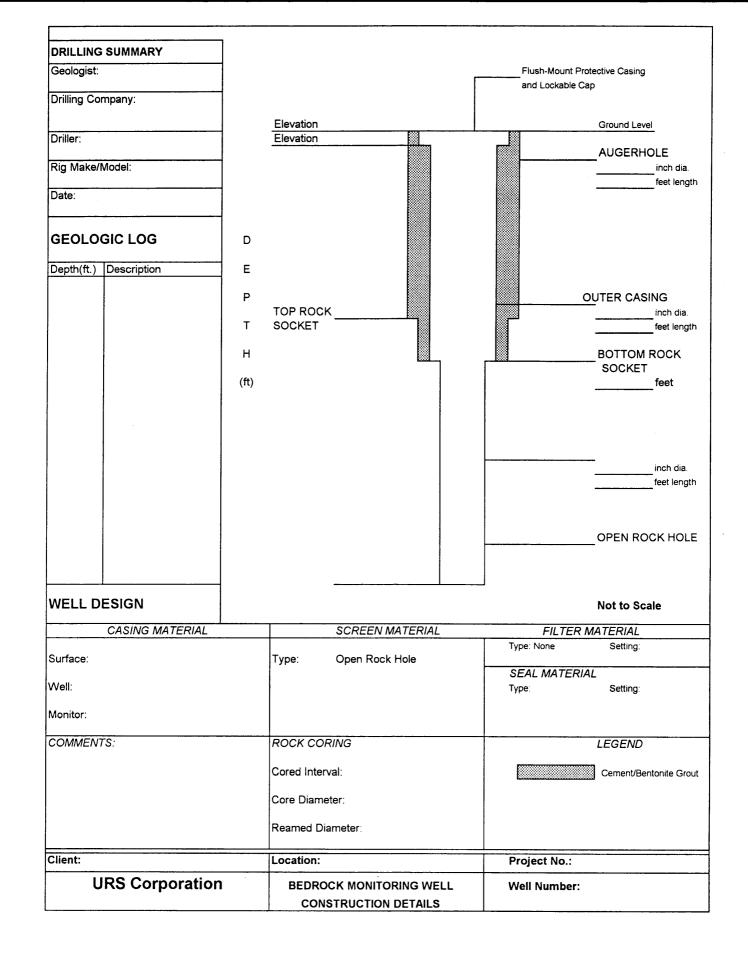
A SHALLOW BEDROCK MONITORING WELL CONSTRUCTION DETAIL FORM
